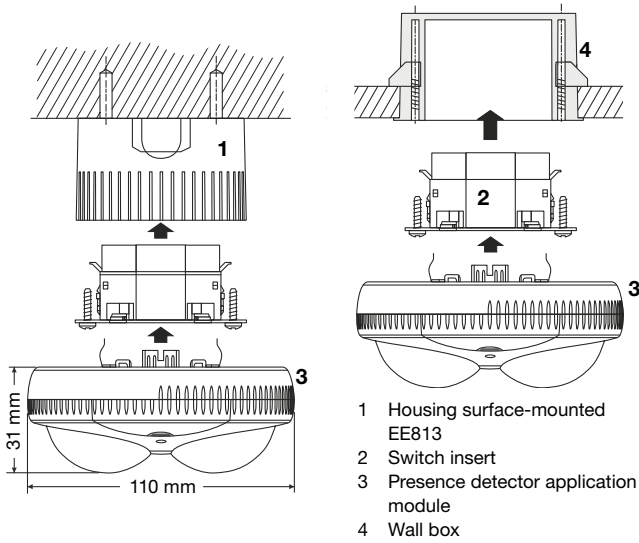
Installation in suspended ceiling or in wall-mounted housing EE813
